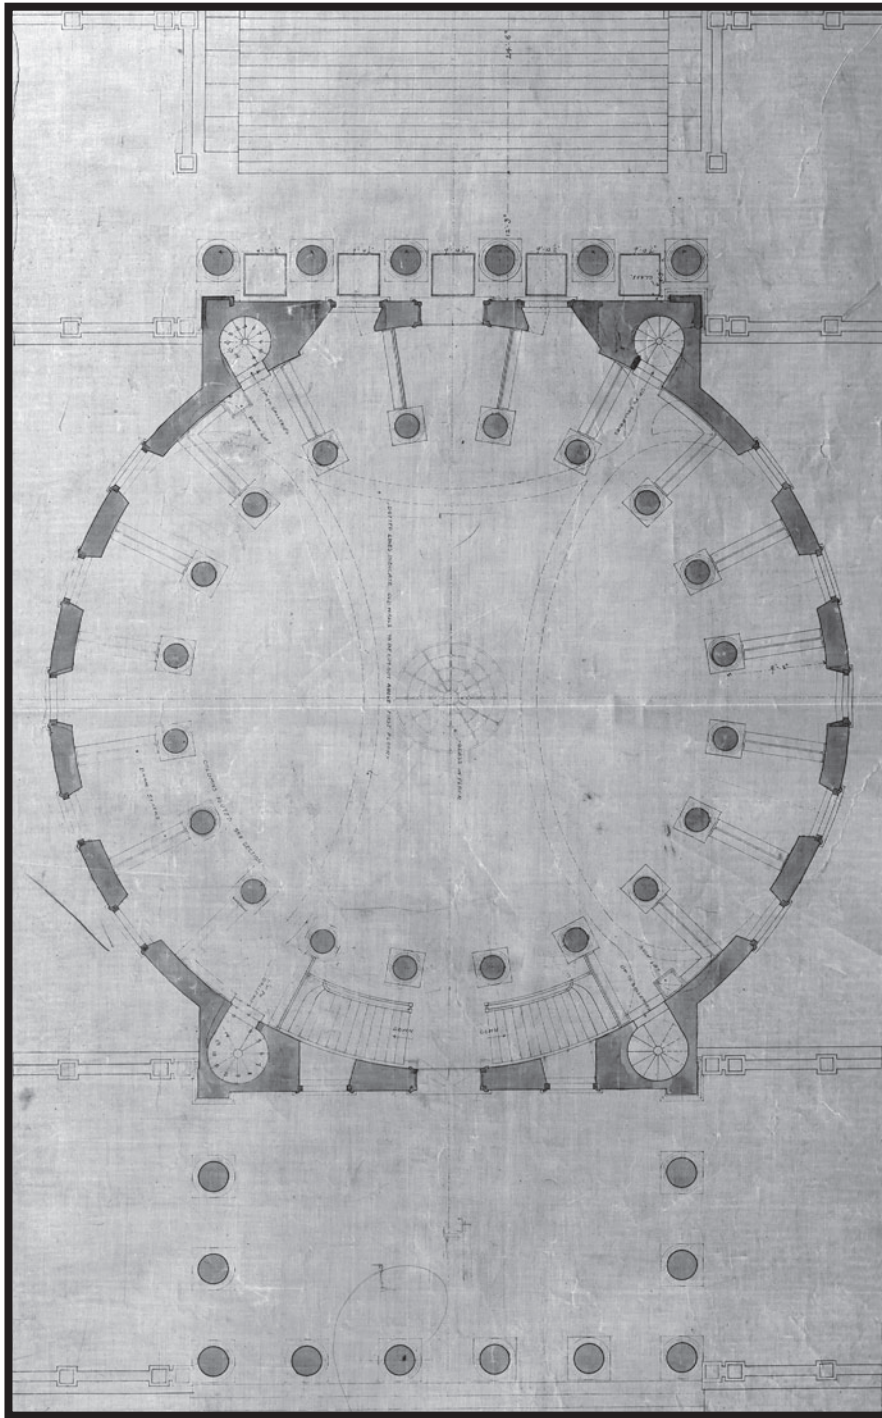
McKim, Mead and White, plan of the Dome Room.
